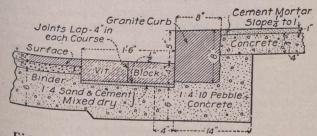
Granite Curb and Vitrified Brick Gutter.
